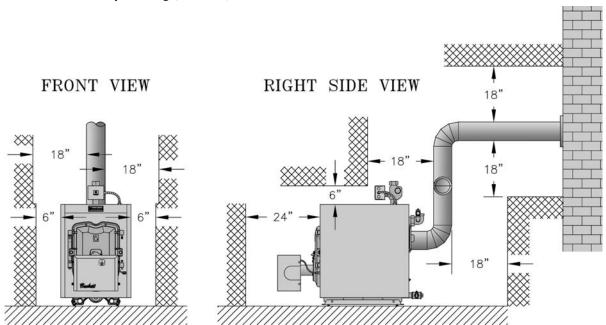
Minimum Installation Clearances To Combustible Materials (Inches)
